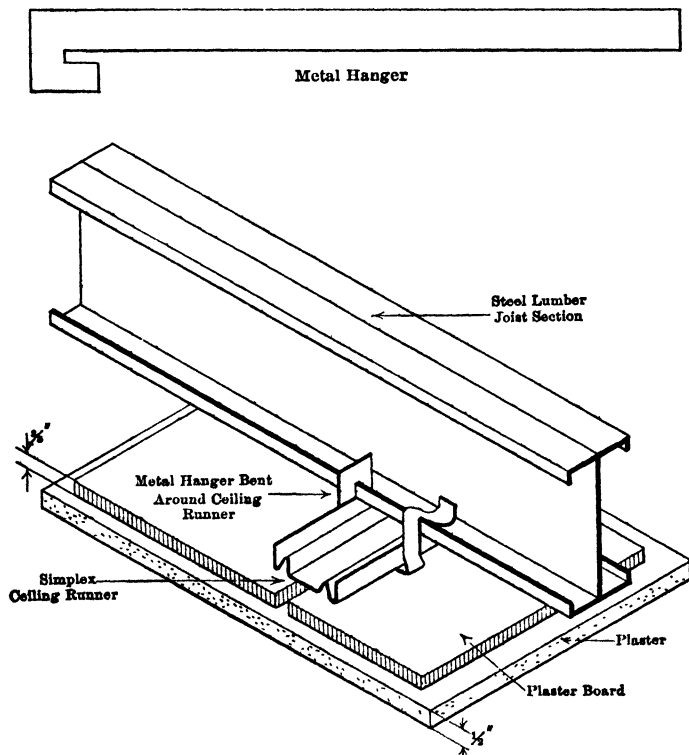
Simplex Steel Products Co., 1-Hour Ceiling Protection. Showing Construction of Ceilings and Method of Hanging Simplex Ceiling Runners to Steel Lumber
